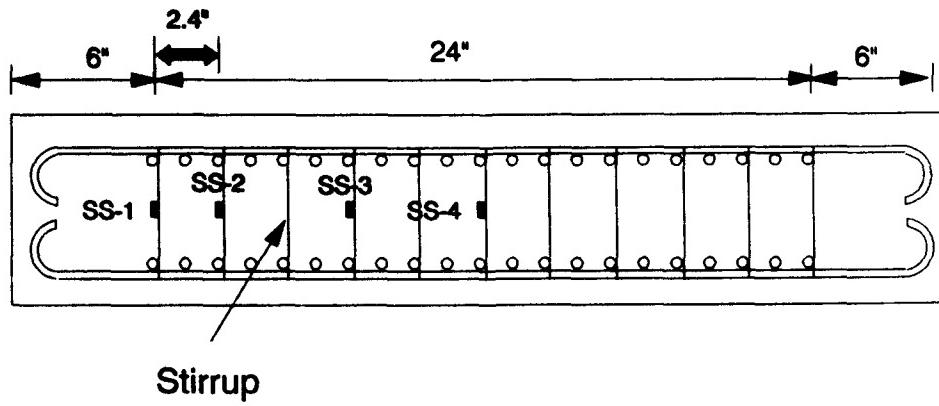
Strain Gage Locations on Stirrups in Slab Nos. 10 and 15
